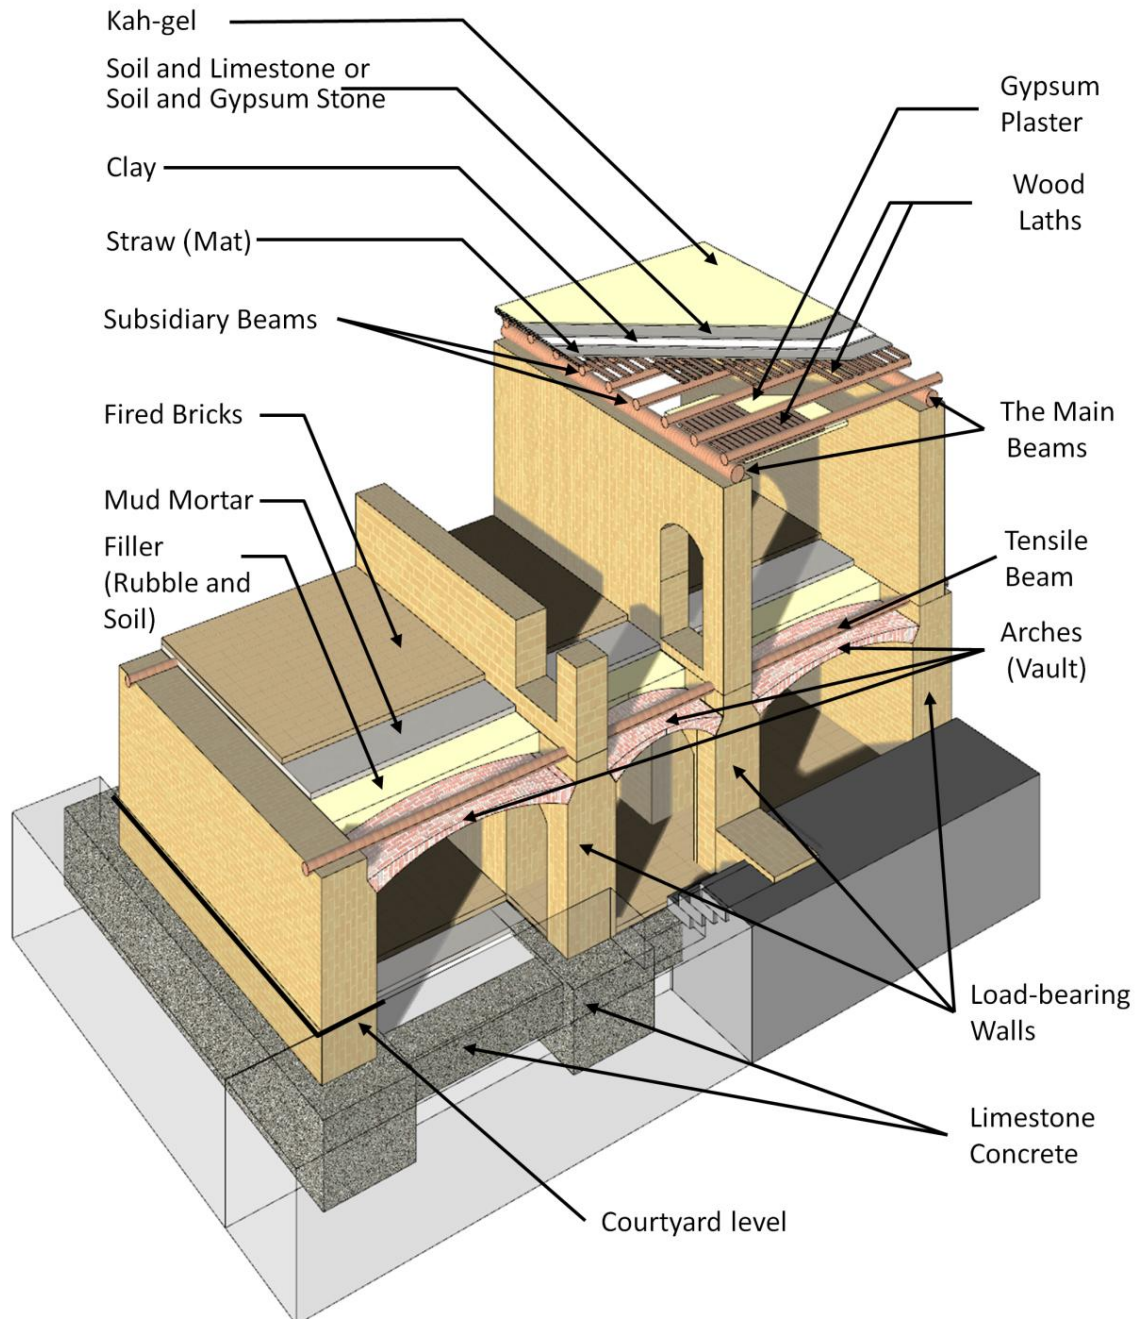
a schematic 3D wall section of a typical two-story Qajar house in Sabzevar
